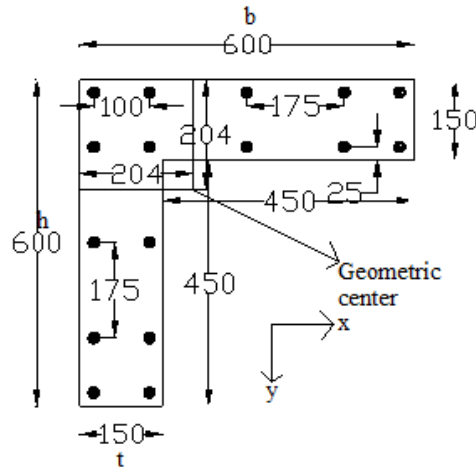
Considered cross section and detailing of L-shaped reinforced concrete wall for analysis (all dimensions in mm).
